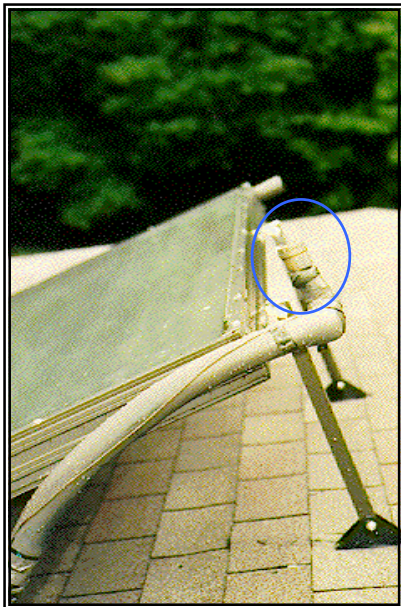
Air vent installed in plane of collector instead of vertically true north.
